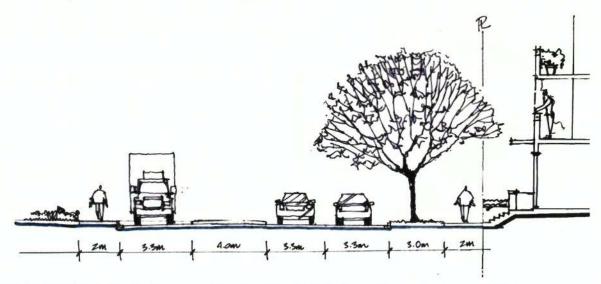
Illustrative Section across Esquimalt Road (Illustrating minimum streetscape widths)
